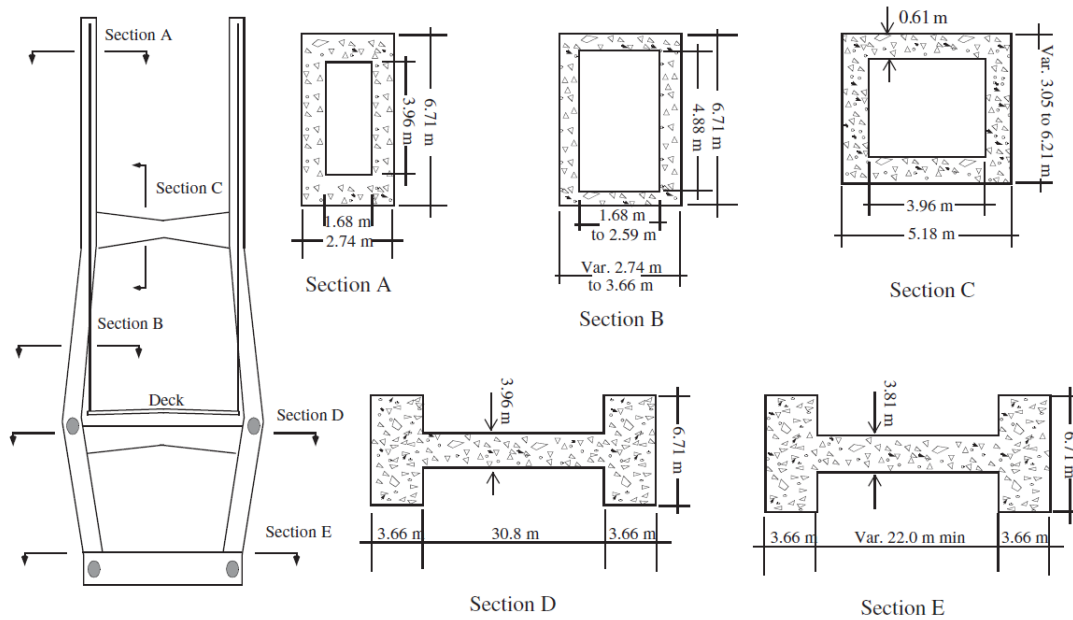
Tower elevation and representative tower cross sections at different levels [3].
